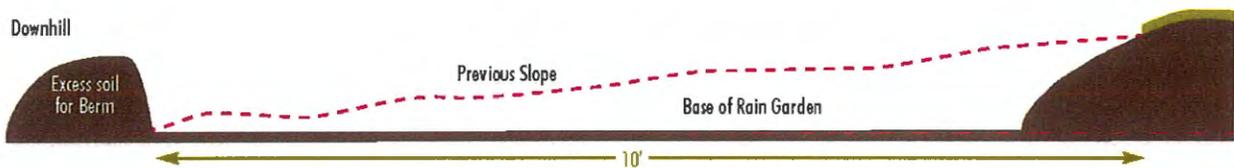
EXCAVATING A RAIN GARDEN SLOPE
